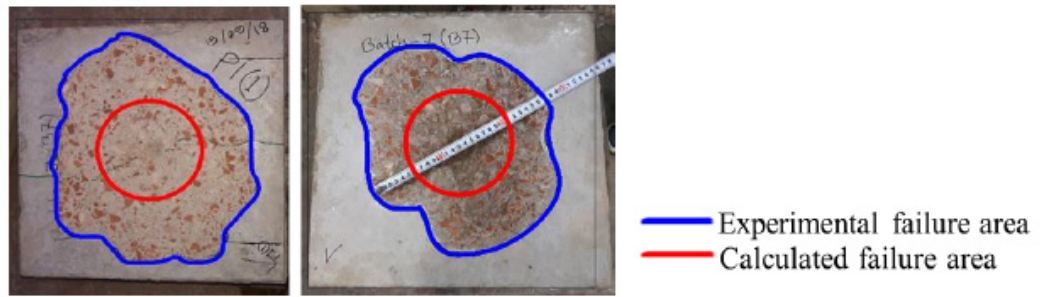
Experimental failure area vs calculated failure area of pullout test of post installed bonded rebar in pure 12.2 N/mm² concrete block (N. Saha et al., 2020)
